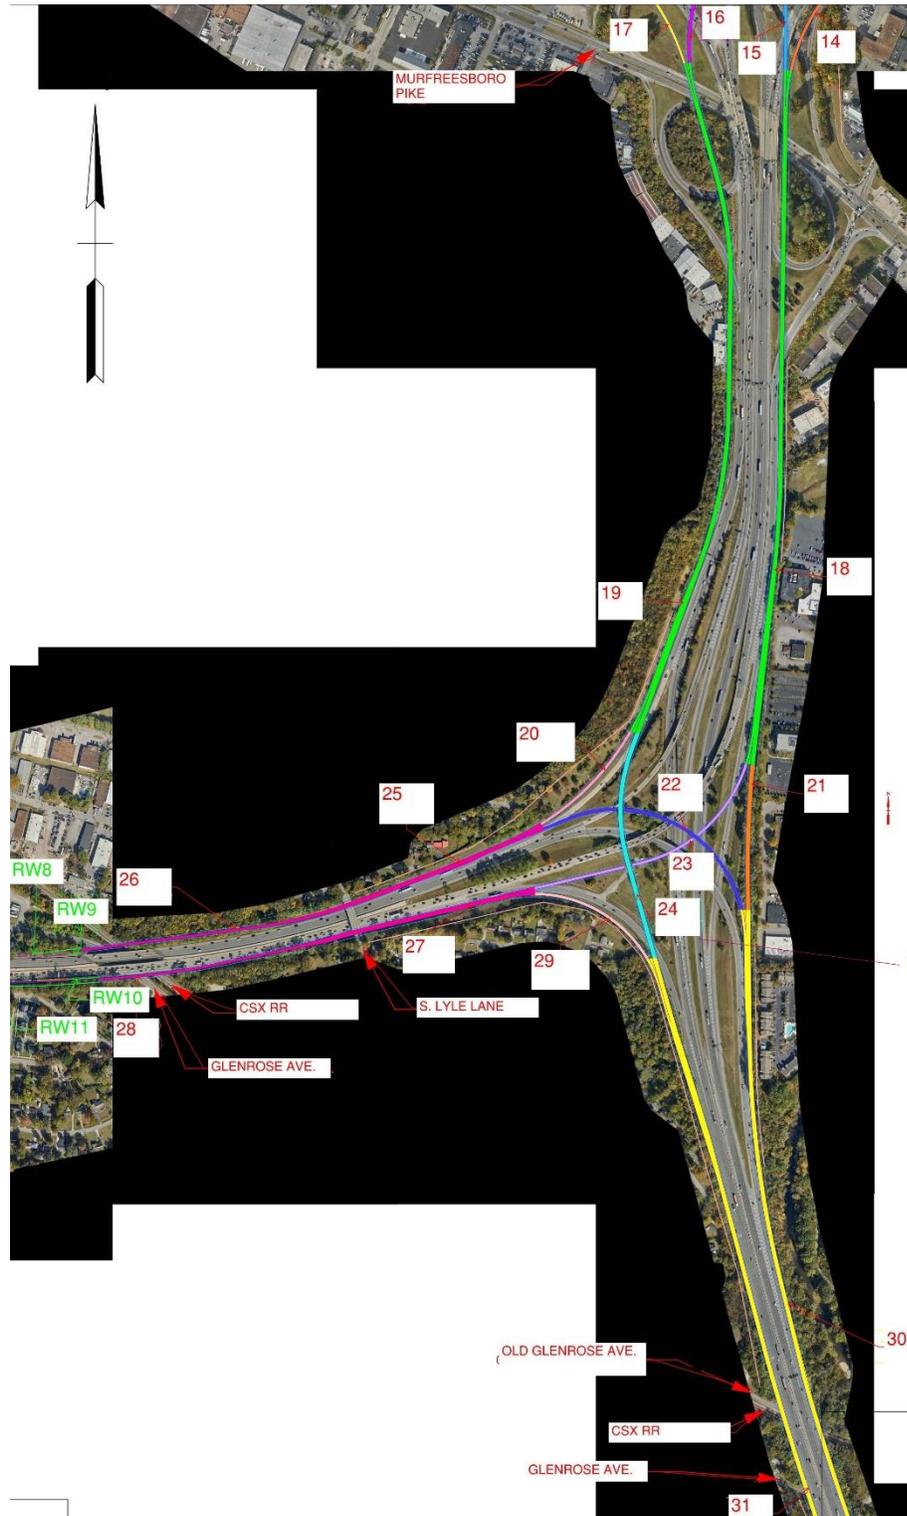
Alternative 2, Bridge and Retaining Wall Locations, Spence Ln to I-40/SR 155 (Briley Parkway) Interchange
